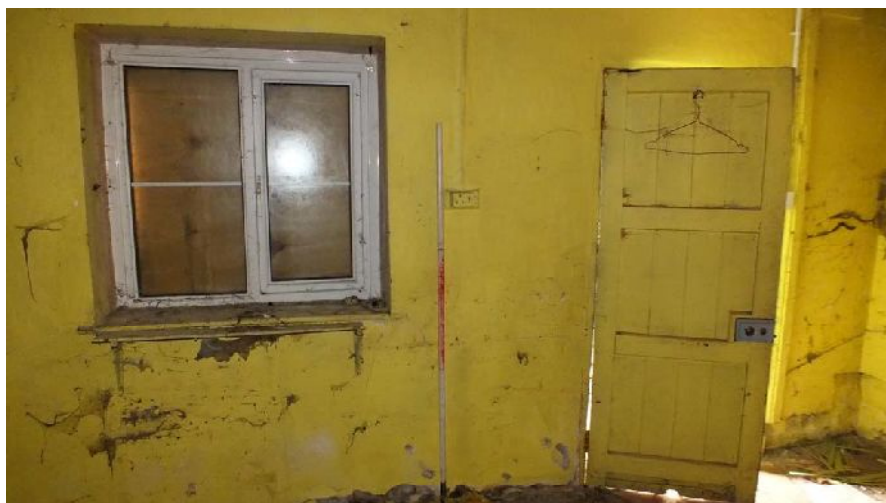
(left): The north-east elevation, Room G8, viewed from the south-west
